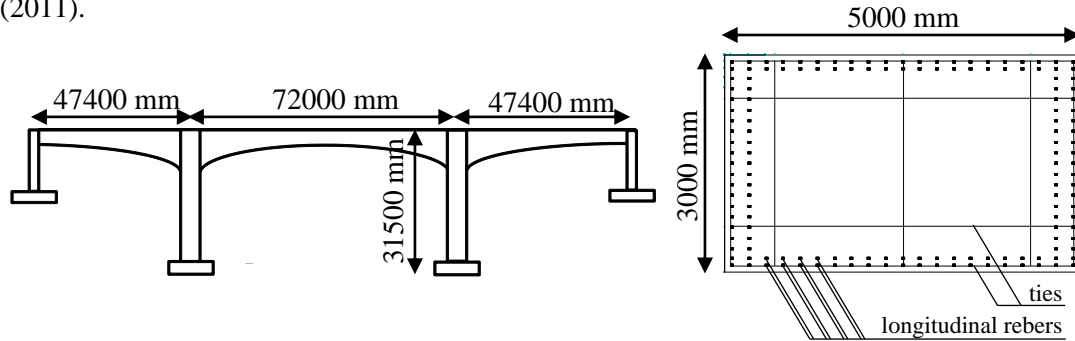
Rigid-frame concrete bridge and cross-section of the RC bridge pier
